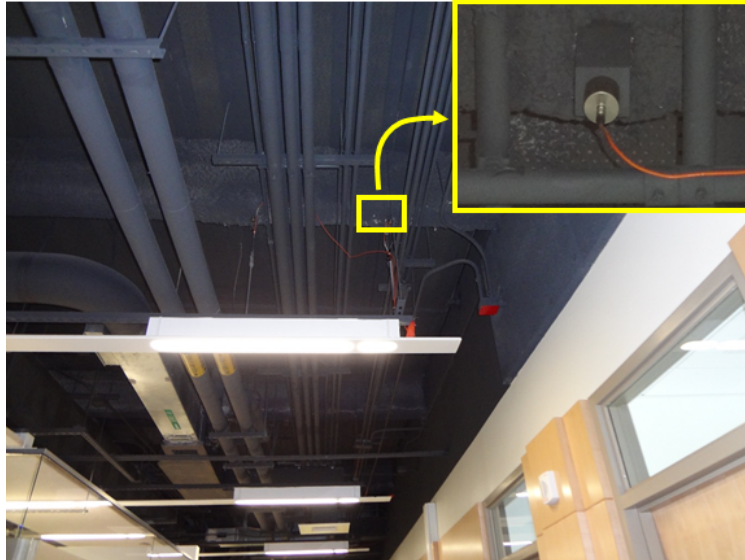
Photograph of sensor placement on the 3rd floor ceiling of Goodwin Hall for measuring impacts on the 4th floor. The inset photograph shows a single axis accelerometer (PCB model 393B04) fastened to its welded mounting post on the steel girder. The steel girders are coated with a fire retardant material except for the mounting locations of the sensors. Photograph made by the dissertation author.
